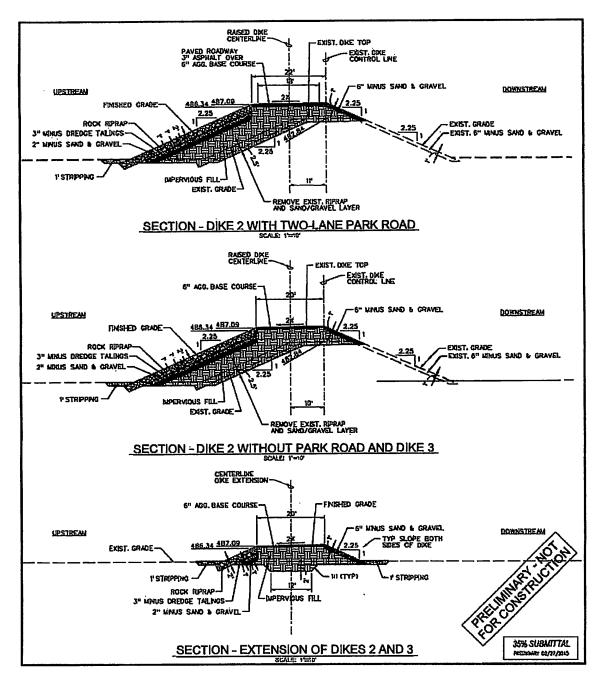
Preliminary typical cross sections for 3.5-foot raise at Dike 2 and Dike 3.
